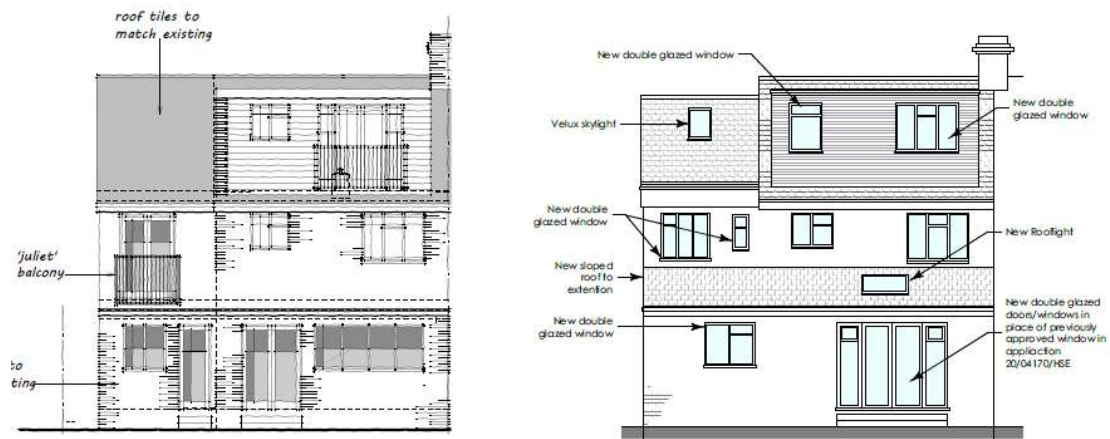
previously approved rear elevation (left) and proposed rear elevation (right)
